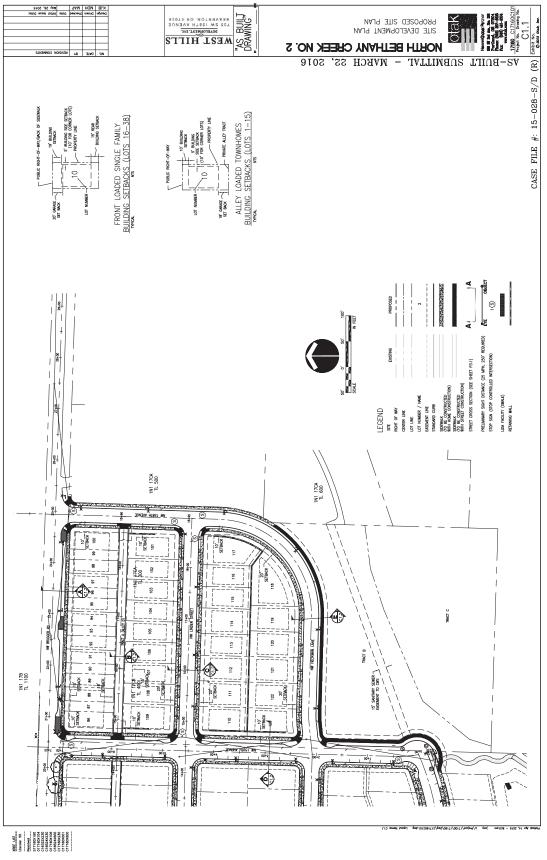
A subdivision site plan shows the layout of the project on the land. (Courtesy of Otak, Inc.)
